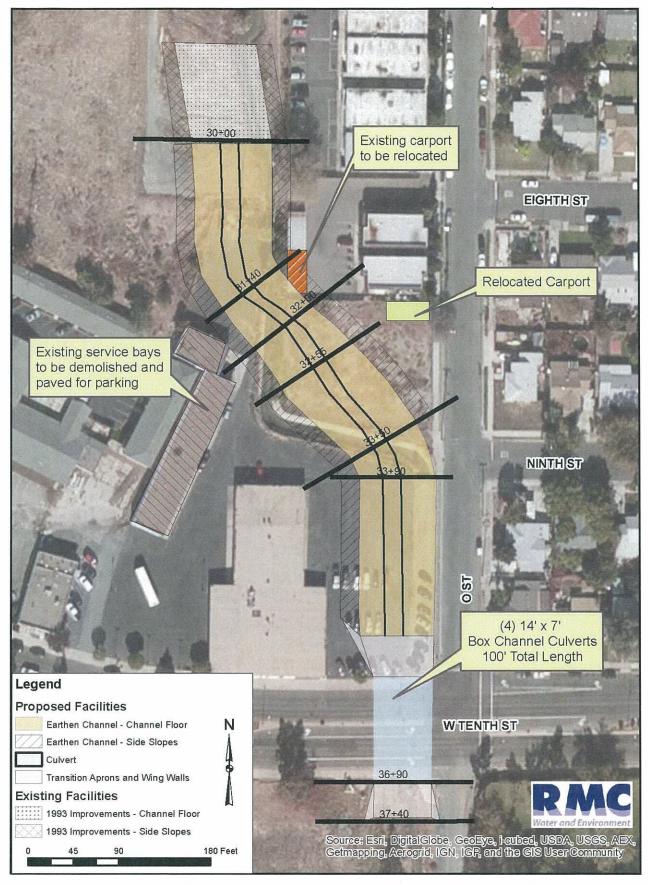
Alternative 5 - Alternate Minimum Culvert Option
